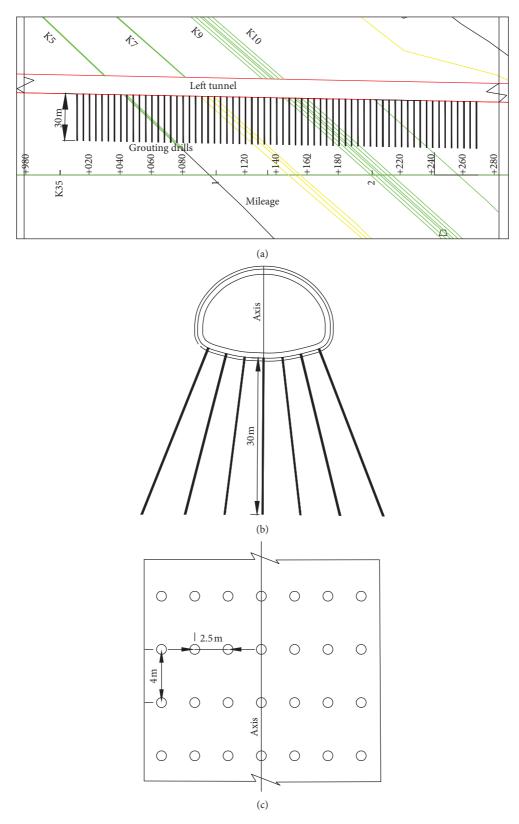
The grouting drill design drawing. (a) Vertical section. (b) Cross section. (c) Ichnography.
